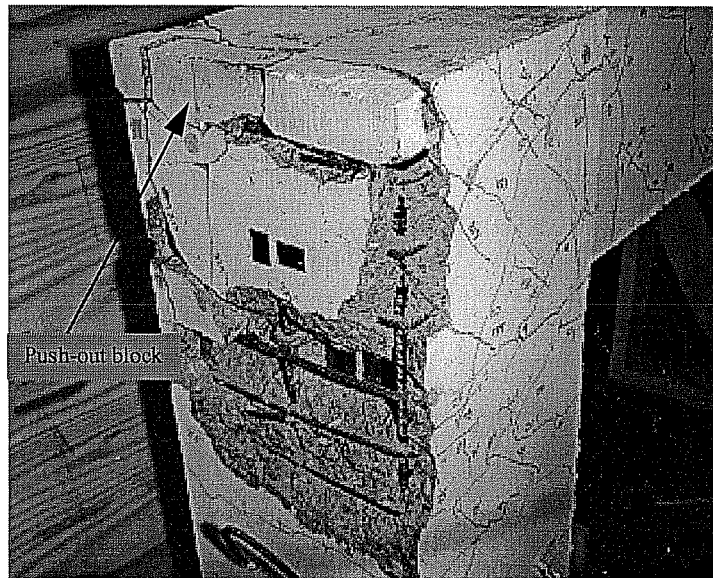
Knee Joint specimen at end of Test - McConell and Wallace [7]
